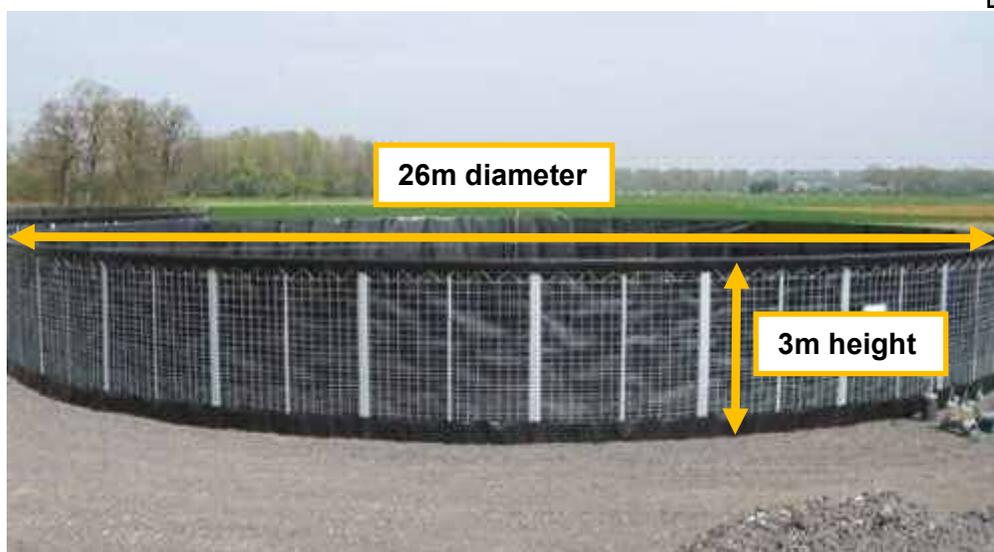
Image showing the full width of the storage tank and the steel mesh with HDPE liner walls.
